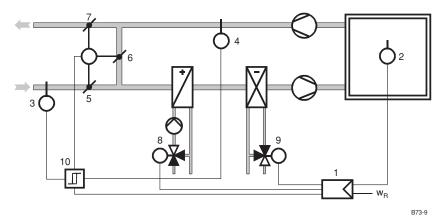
Sequential control, air dampers – heating valve – cooling valve
